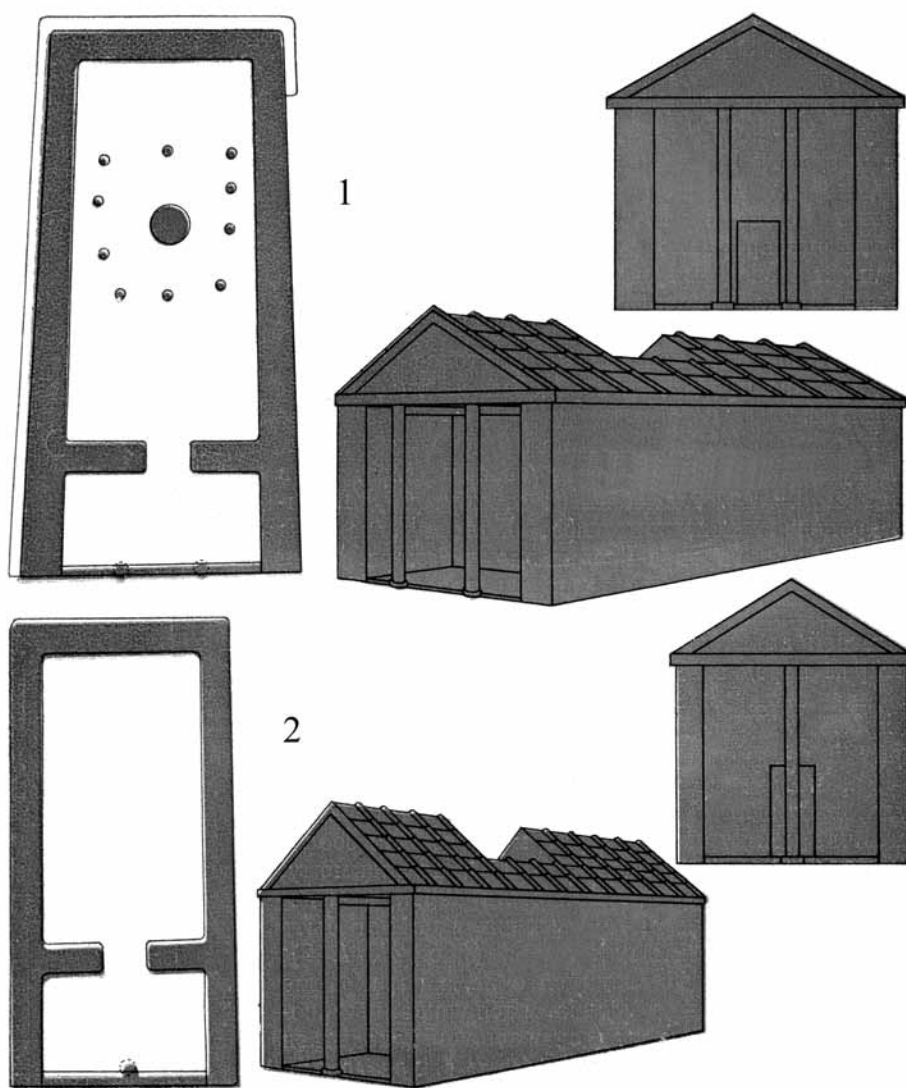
Neapolis. Megaron buildings. Ground plans and cross-sections (Высотская 1979: рис. 21)
